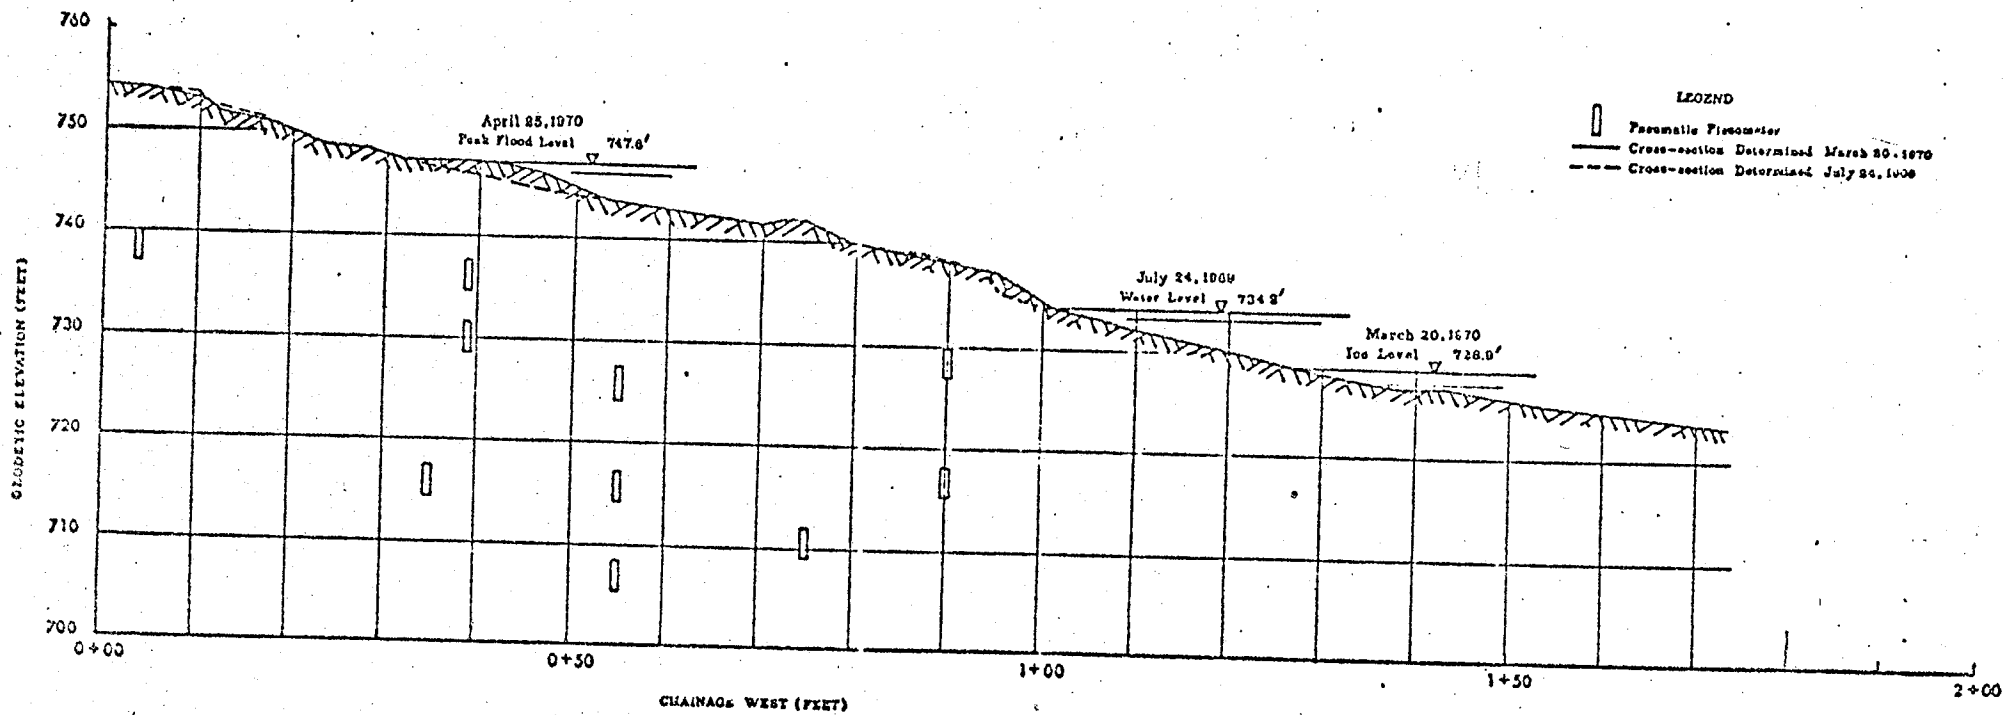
Riverbank Cross-section, instrumentation (St. Boniface Site No. 1)
